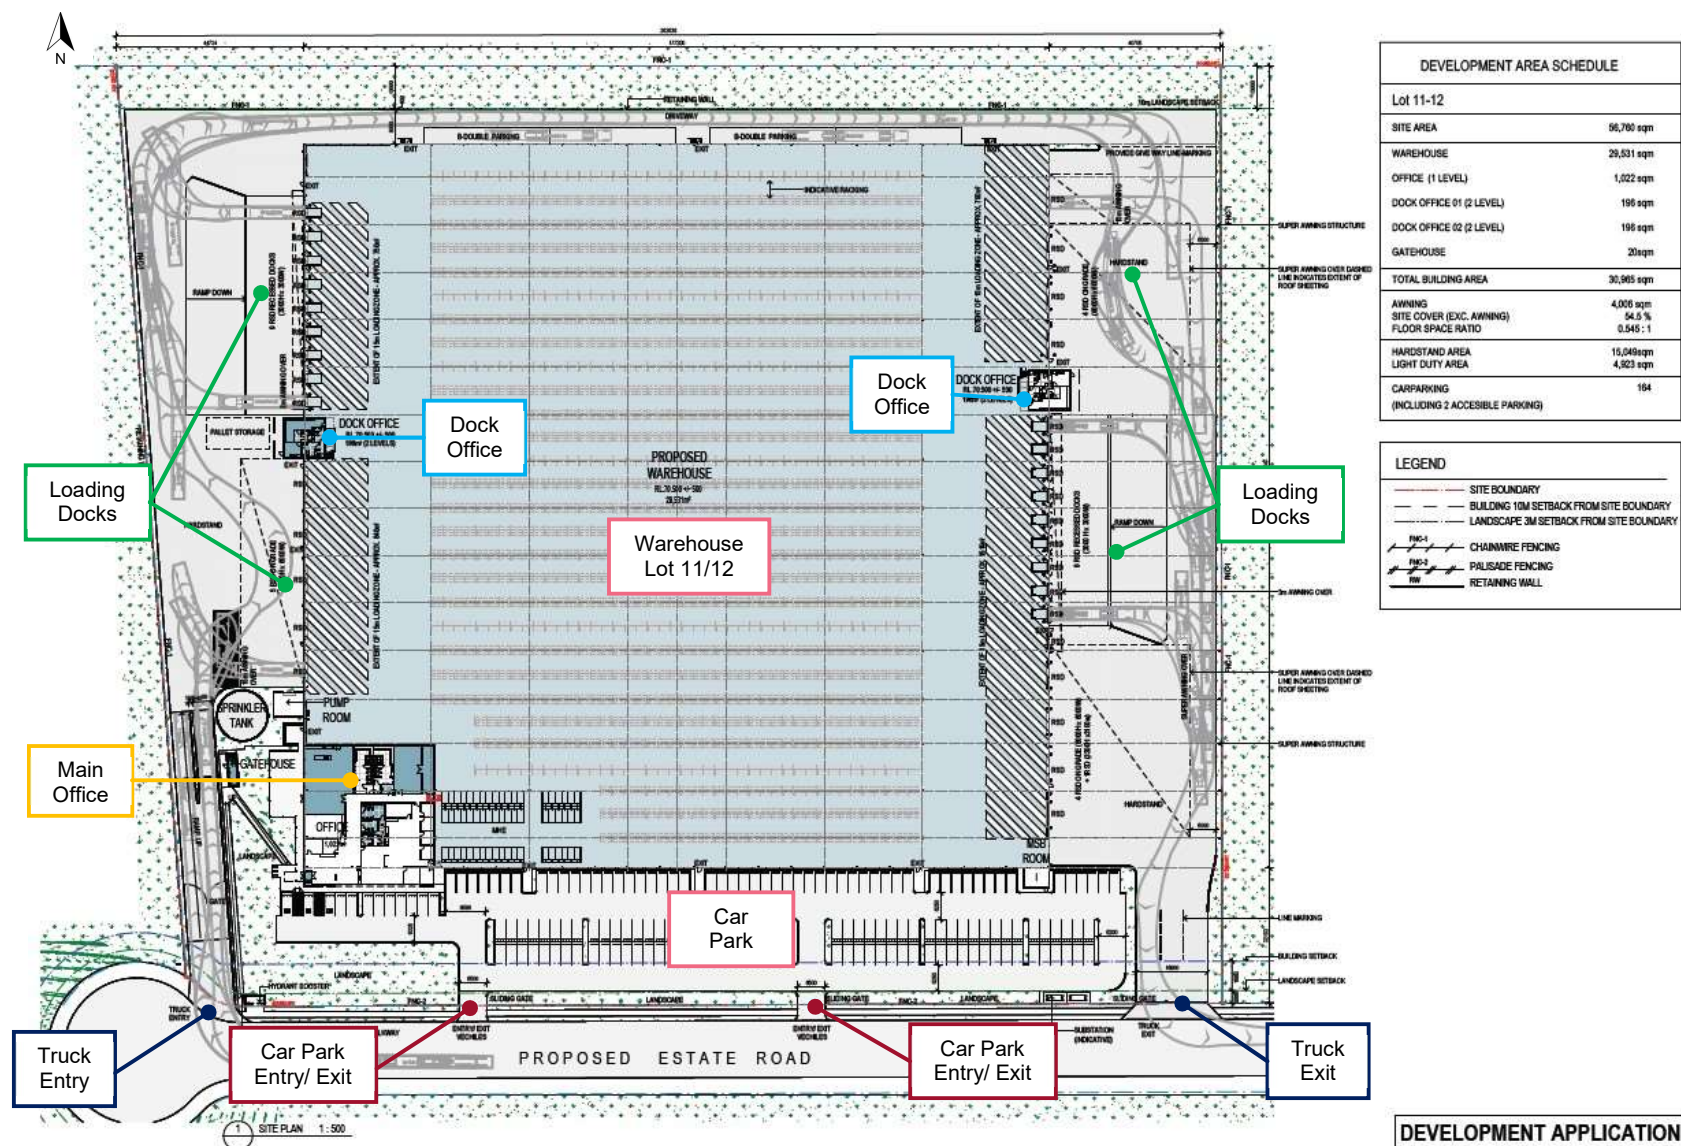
| Proposed DHL Warehouse and Distribution Centre Layout
